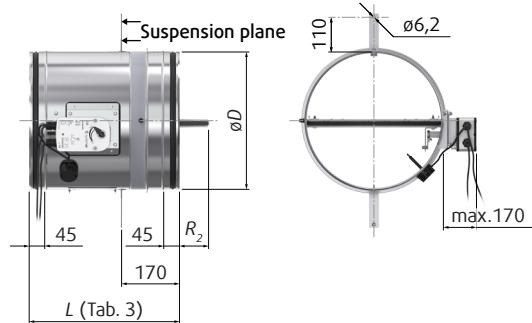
Dimensions of the servomotor controlled circular fire damper PKIR3G - nominal diameter \varnothing 100 to 630 mm
